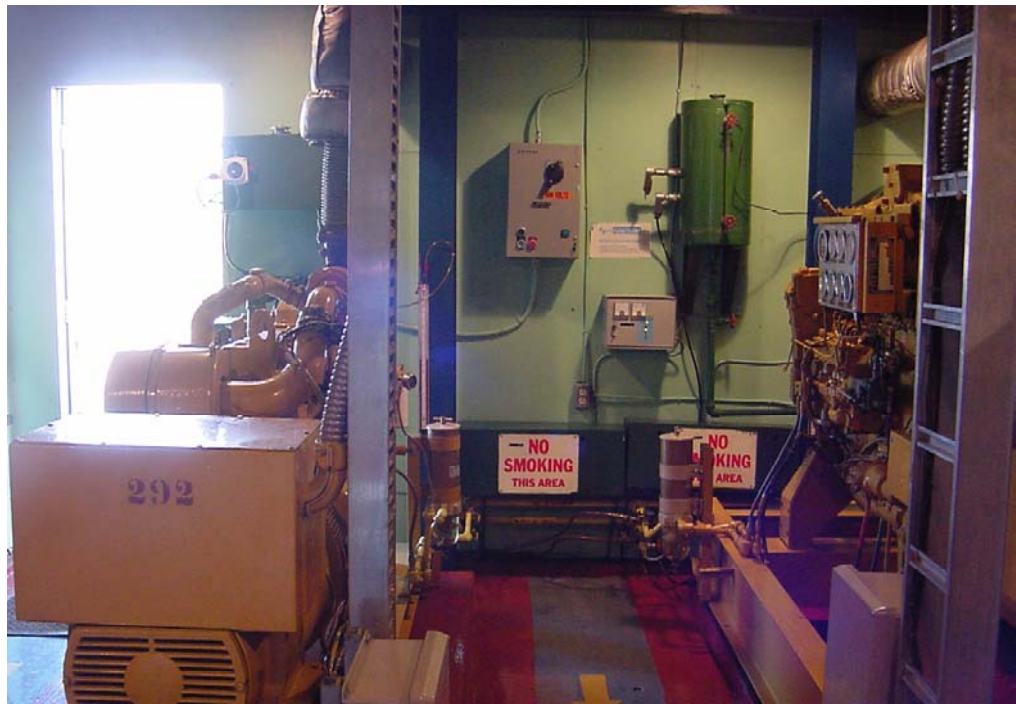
St Lewis Plant—Interior View Showing Space Between Units
